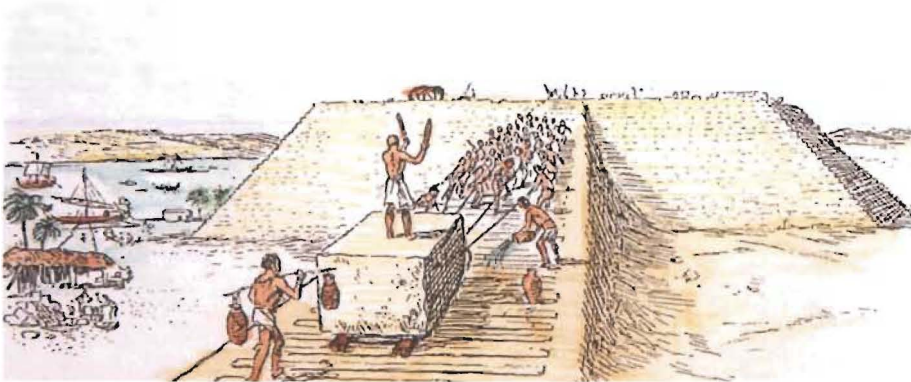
The massive blocks used to build this pyramid were positioned using simple machines.
